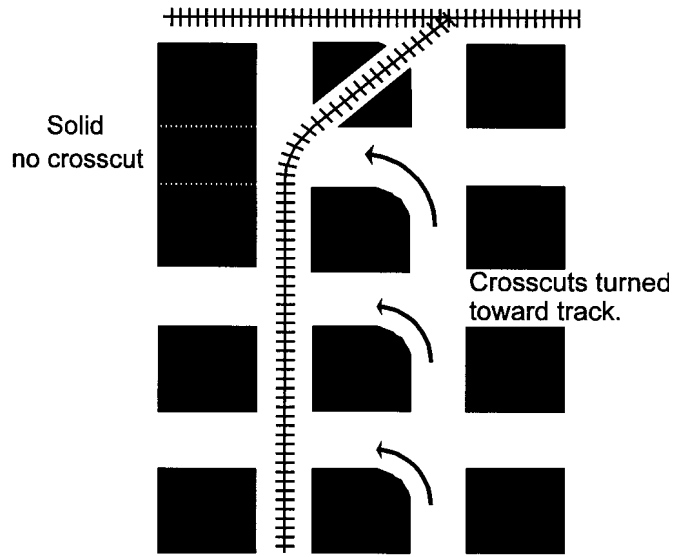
Intersection spans are controlled by turning crosscuts only one way and dropping a crosscut in an already overspanned track chute.
